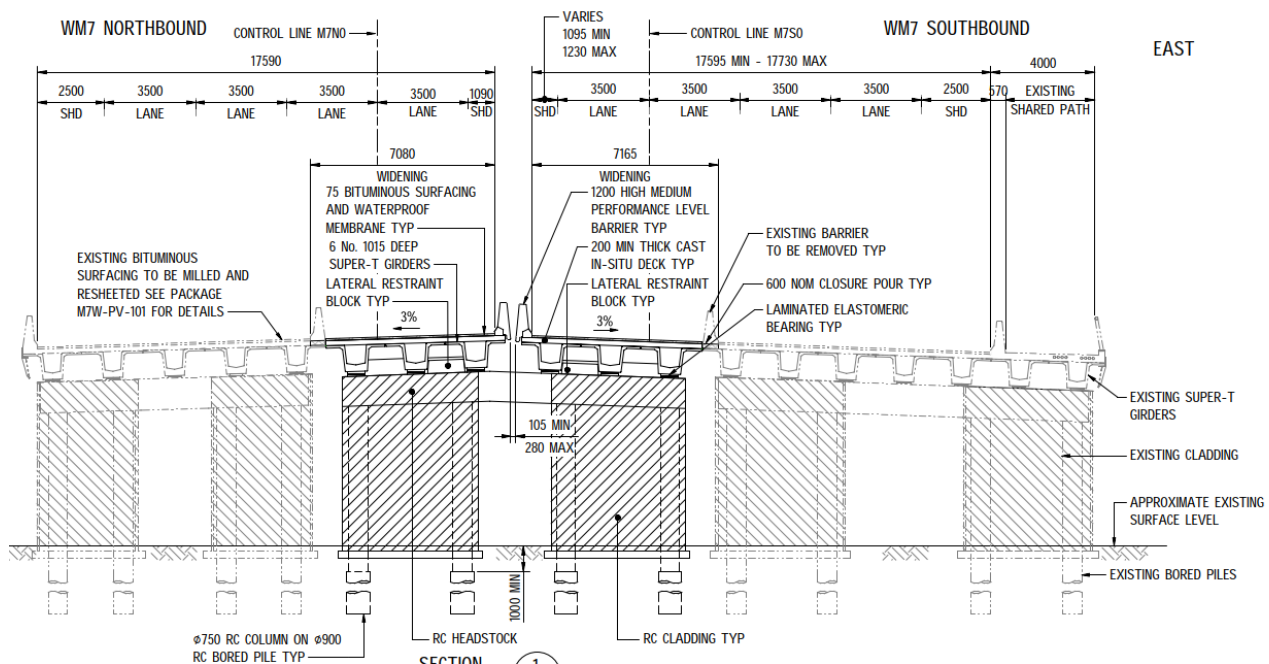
Full width widening section over Piers (shown for Infra 15.0/15.1)
